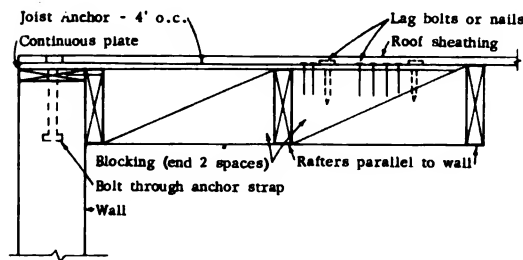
4' Wood Ledger and Roof Sheathing Anchorage
